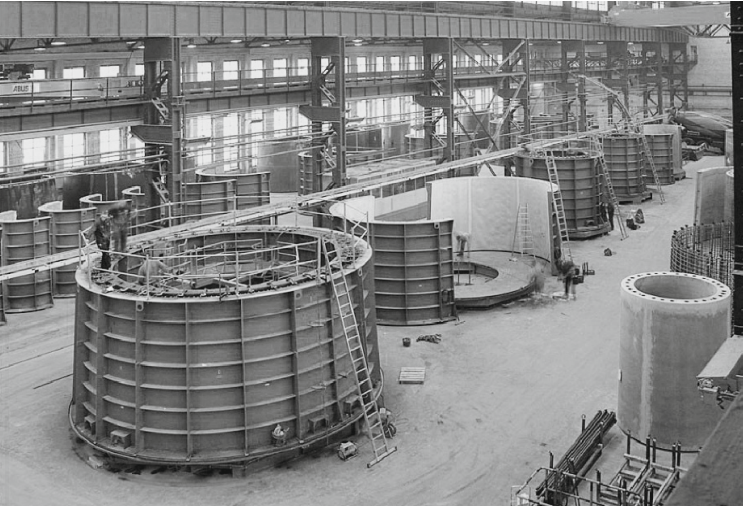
Production of tower segments for a prefabricated prestressed-concrete tower (WEC-Turmbau)
